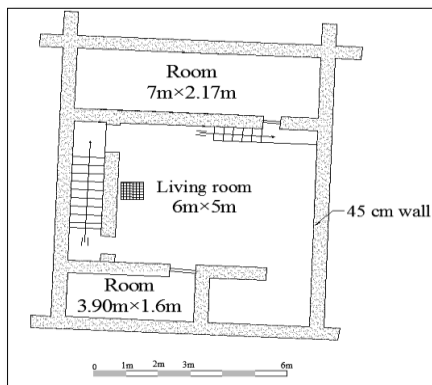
Second floor plan of Abdulsalam Ali house in Ghadames.
